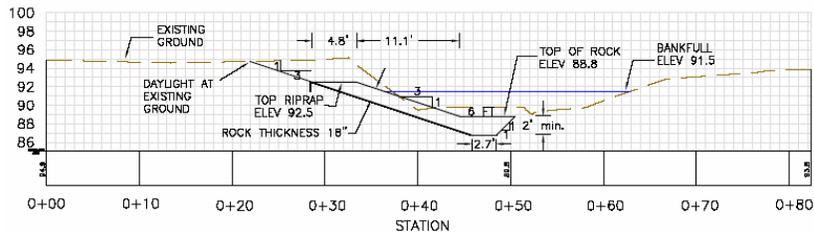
Stream cross-section showing proposed riprap upstream of crossing (looking downstream)
